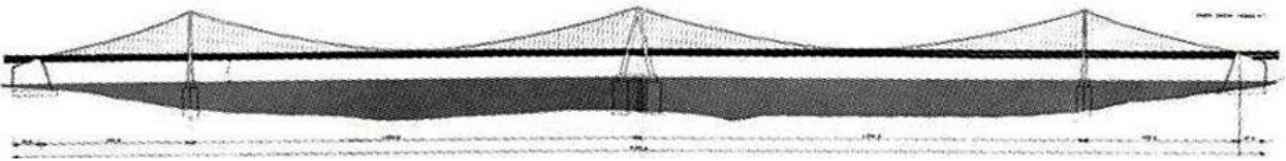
Four span bridged proposed by Arch. Montuori, engineer Calini and Pavlo
